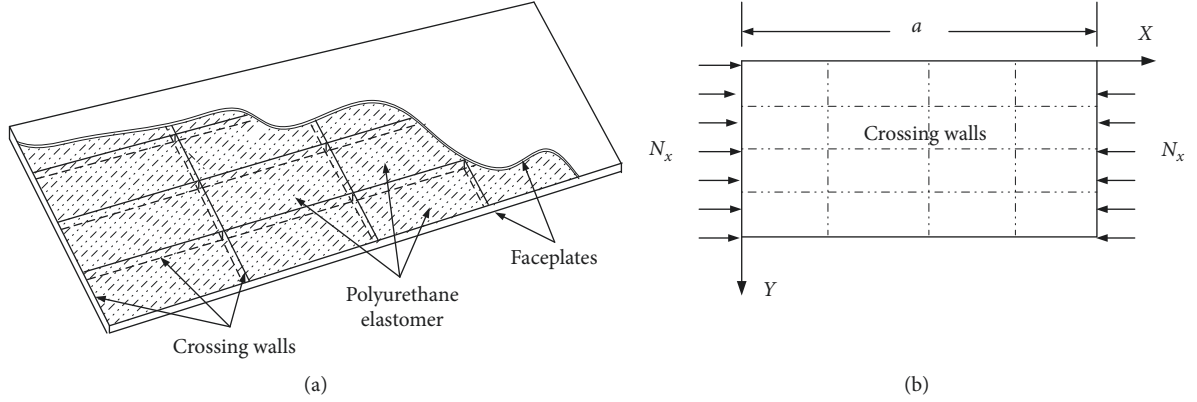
Section of sandwich plate and SPS with stiffeners. (a) Structure sketch of SPS reinforced by cross wall. (b) Simplified loading schematic diagram.
